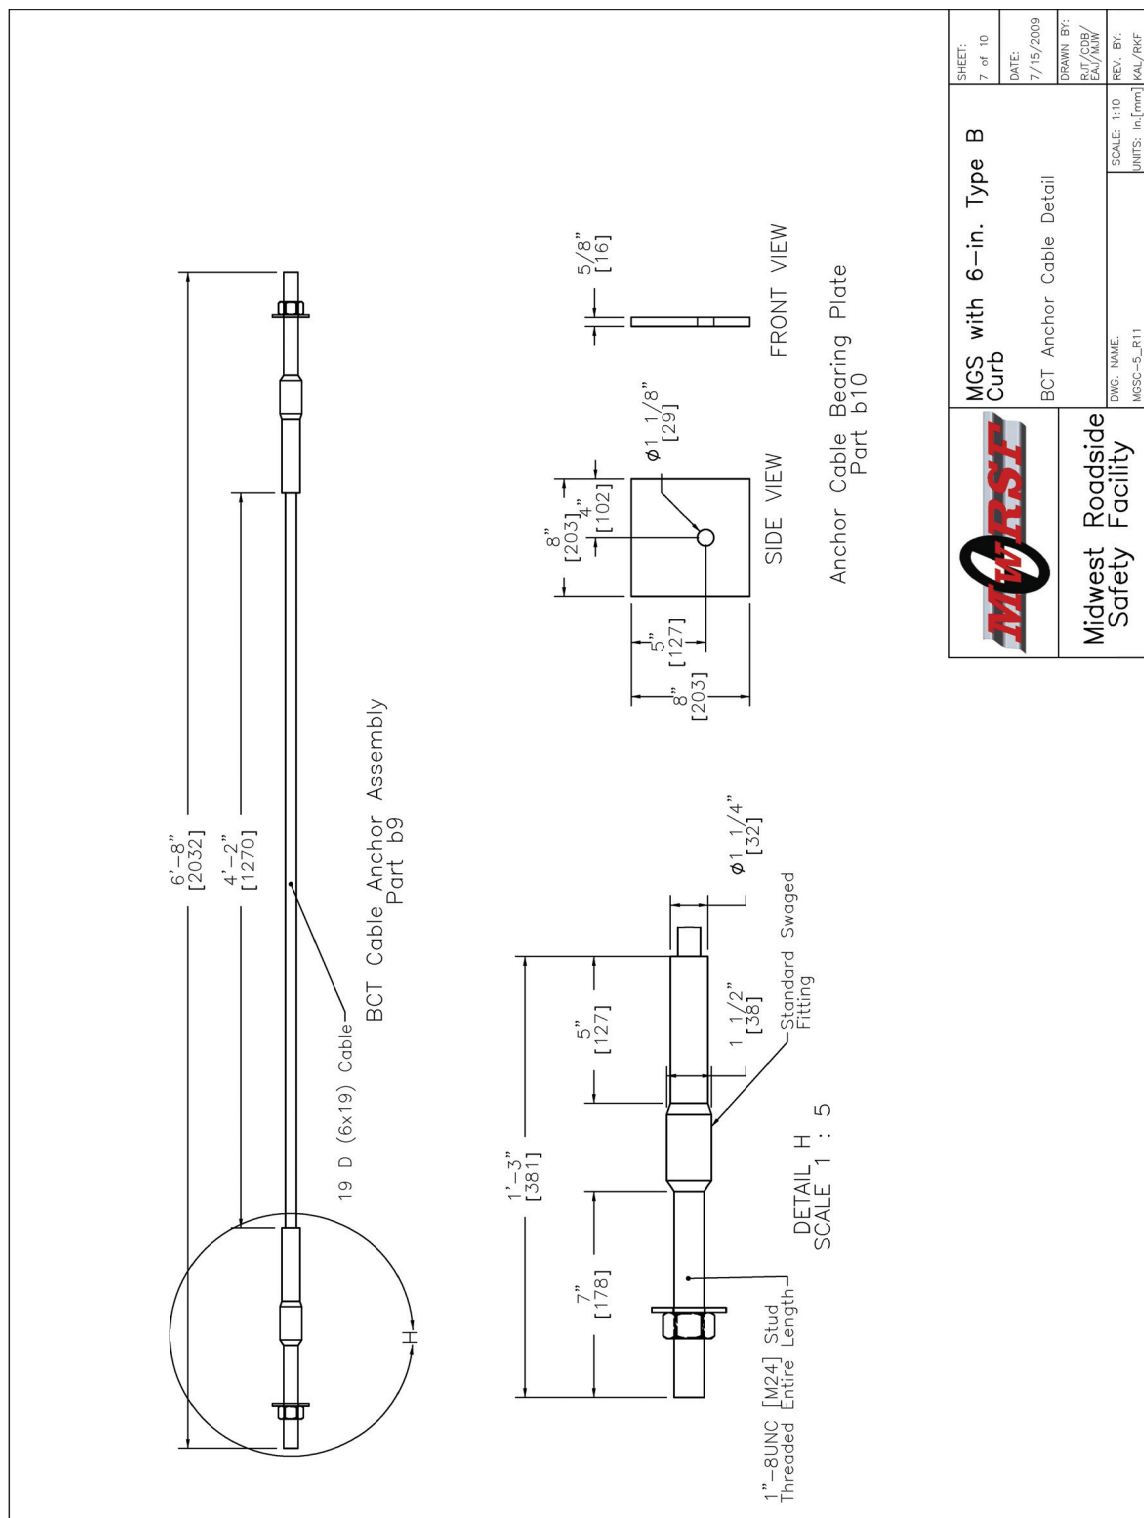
BCT Anchor Cable Details, Test No. MGSC-5
